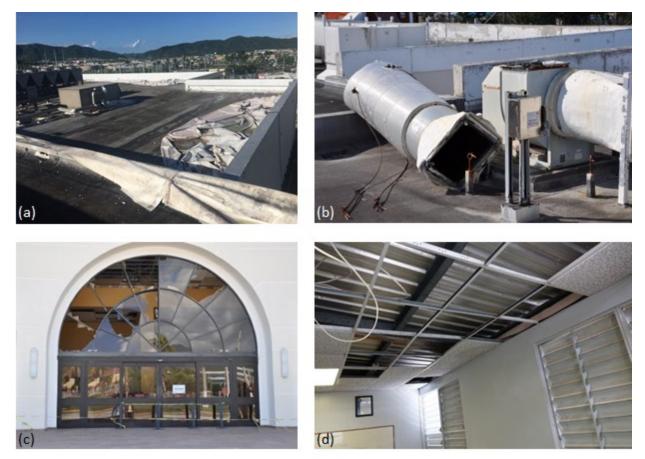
Non-structural damage to engineered buildings: (a) roof covering damage, (b) rooftop equipment damage, (c) window damage, (d) interior damage caused by rainwater penetration.
